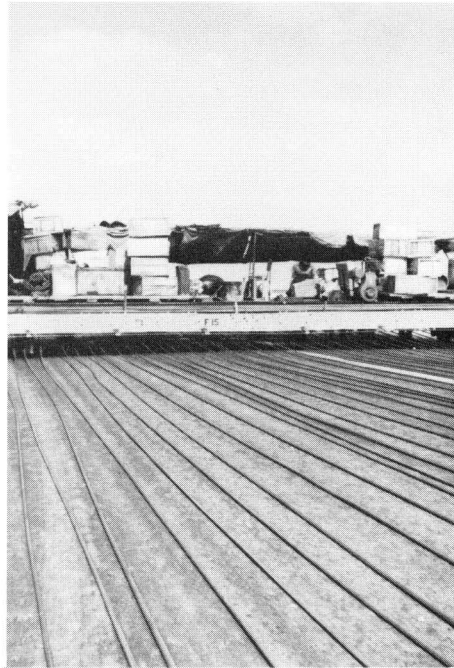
FRONT VIEW OF EQUIPMENT USED FOR FABRICATION OF REINFORCING MAT FROM DEFORMED STEEL BARS; LONGITUDINAL STEEL IS IN FOREGROUND. PAVEMENT WIDTH IS 24 FEET.
